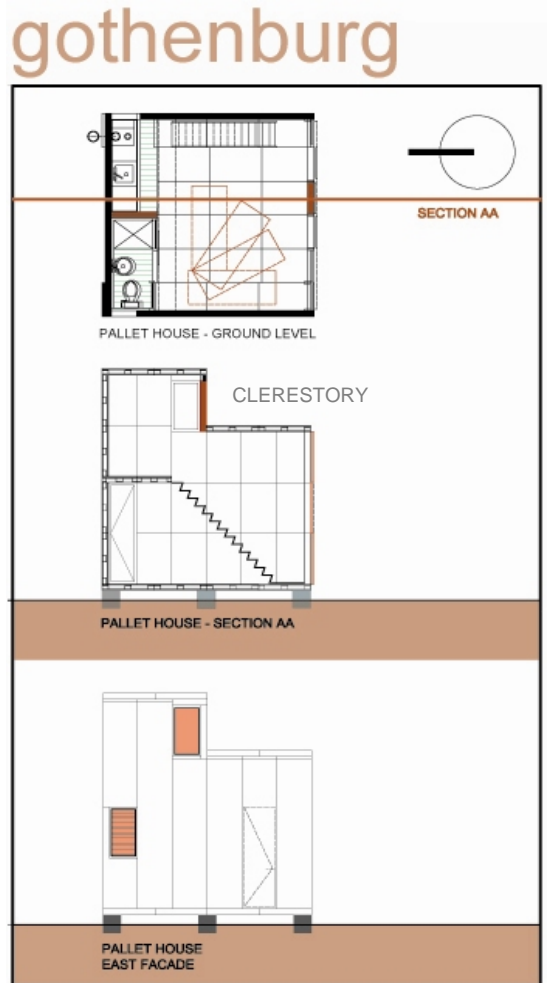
Plan, section and side façade of PHS@ Scandinavian case. Location: Landvetter.
